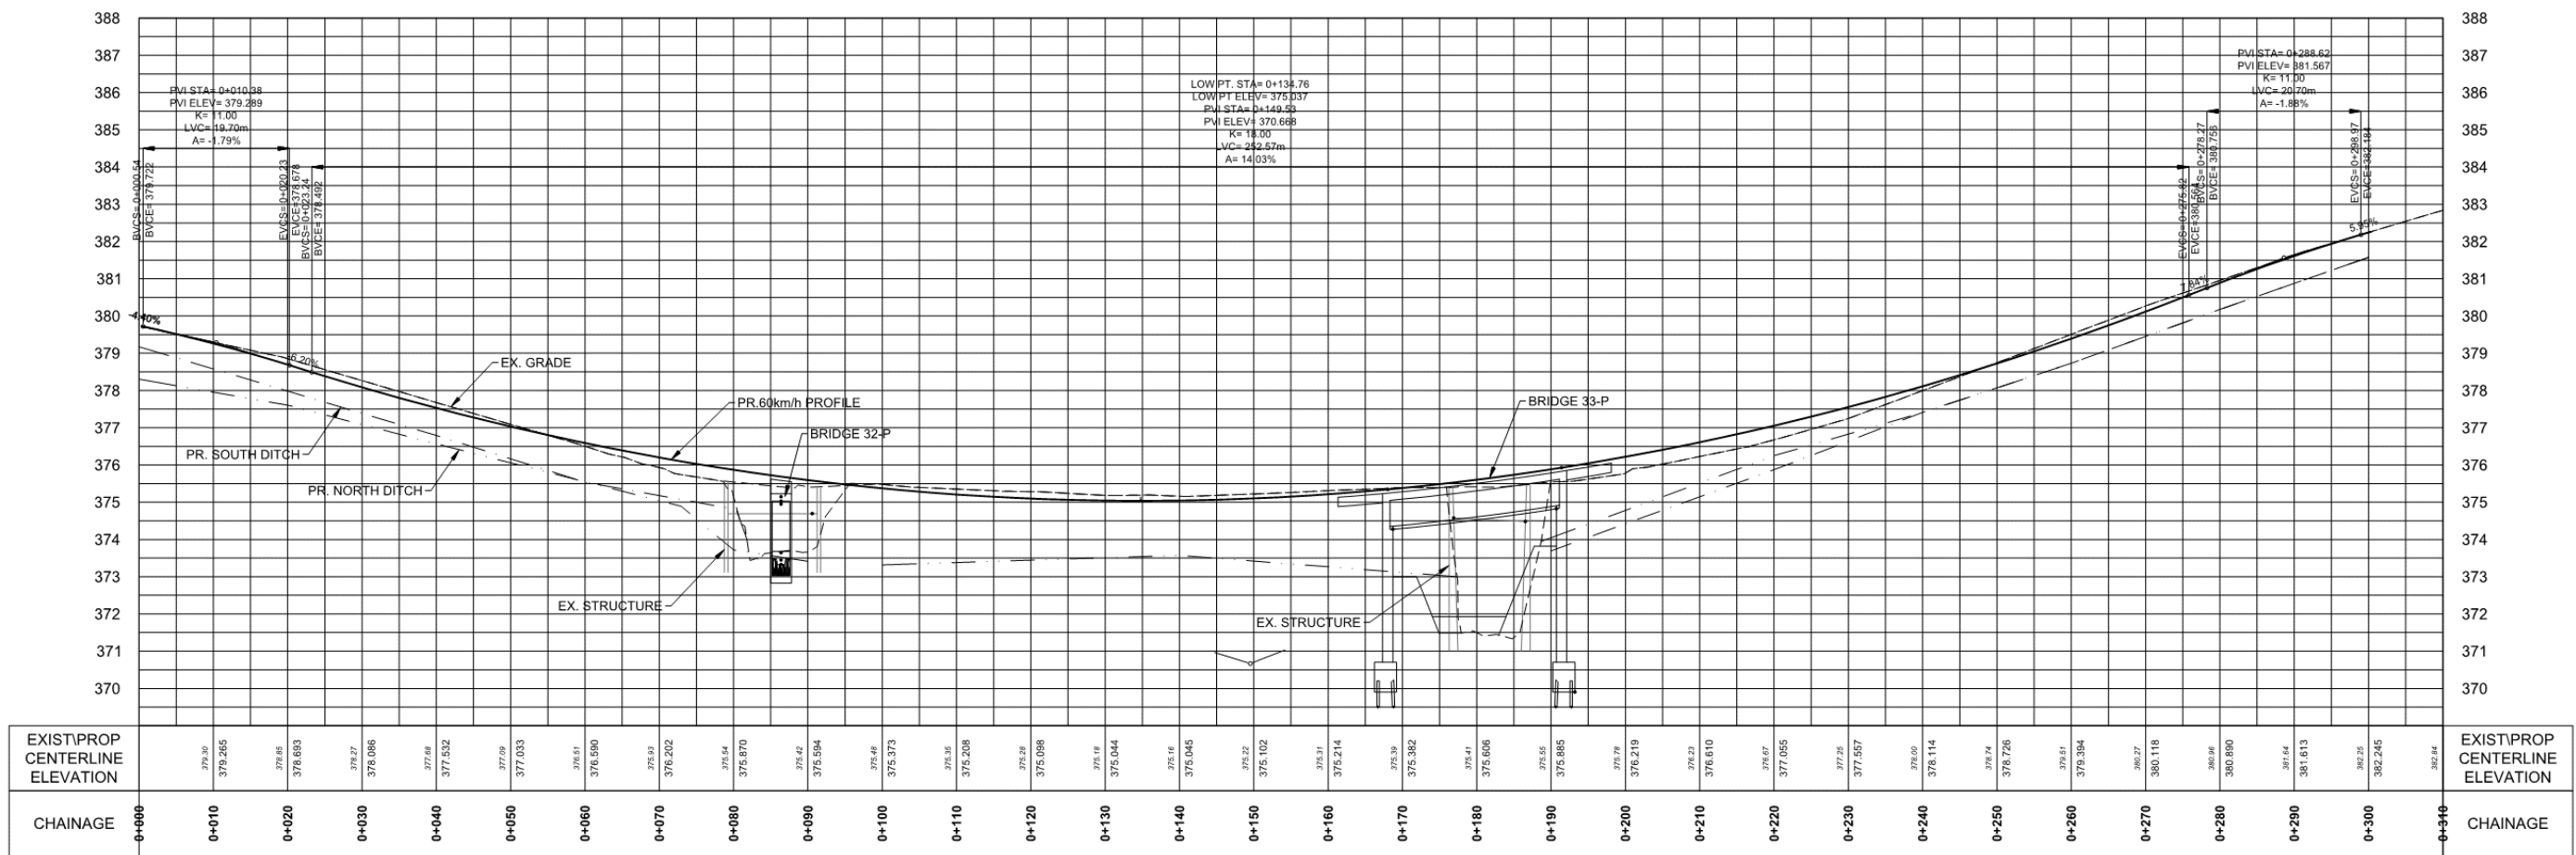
Elevation View of Conceptual Design, Bridge 32-P
